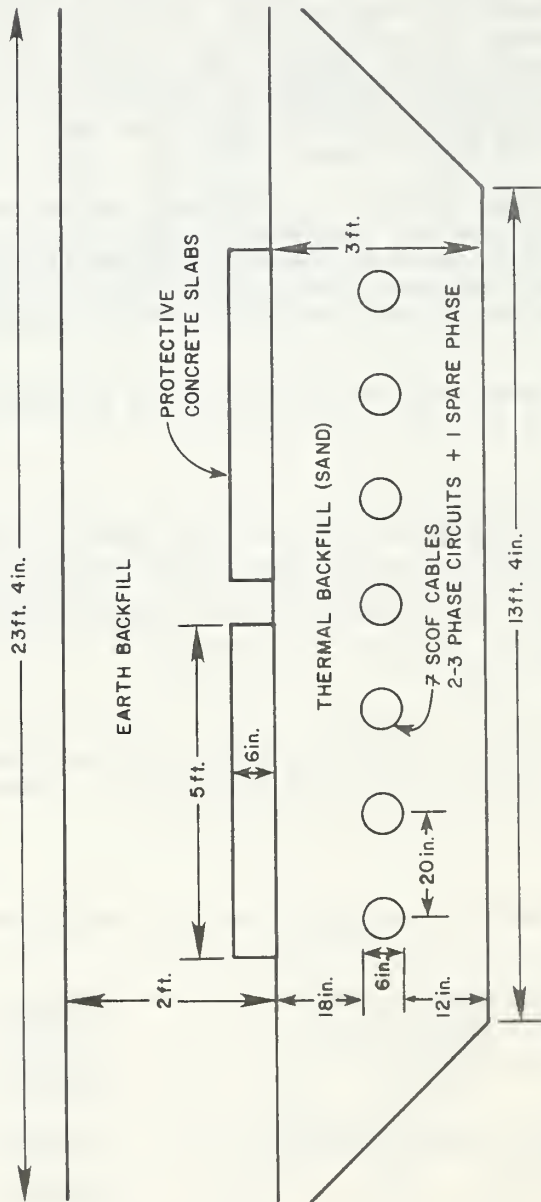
SCOF UNDERGROUND CROSS SECTION
